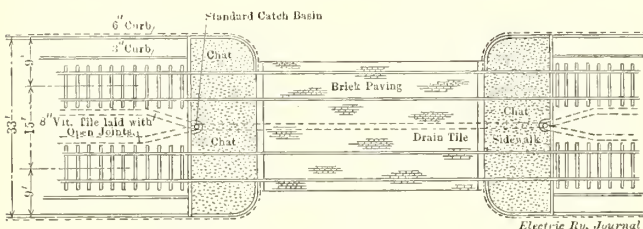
Oklahoma Track—Drainage and Track Construction on Parked Right-of-Way in City
